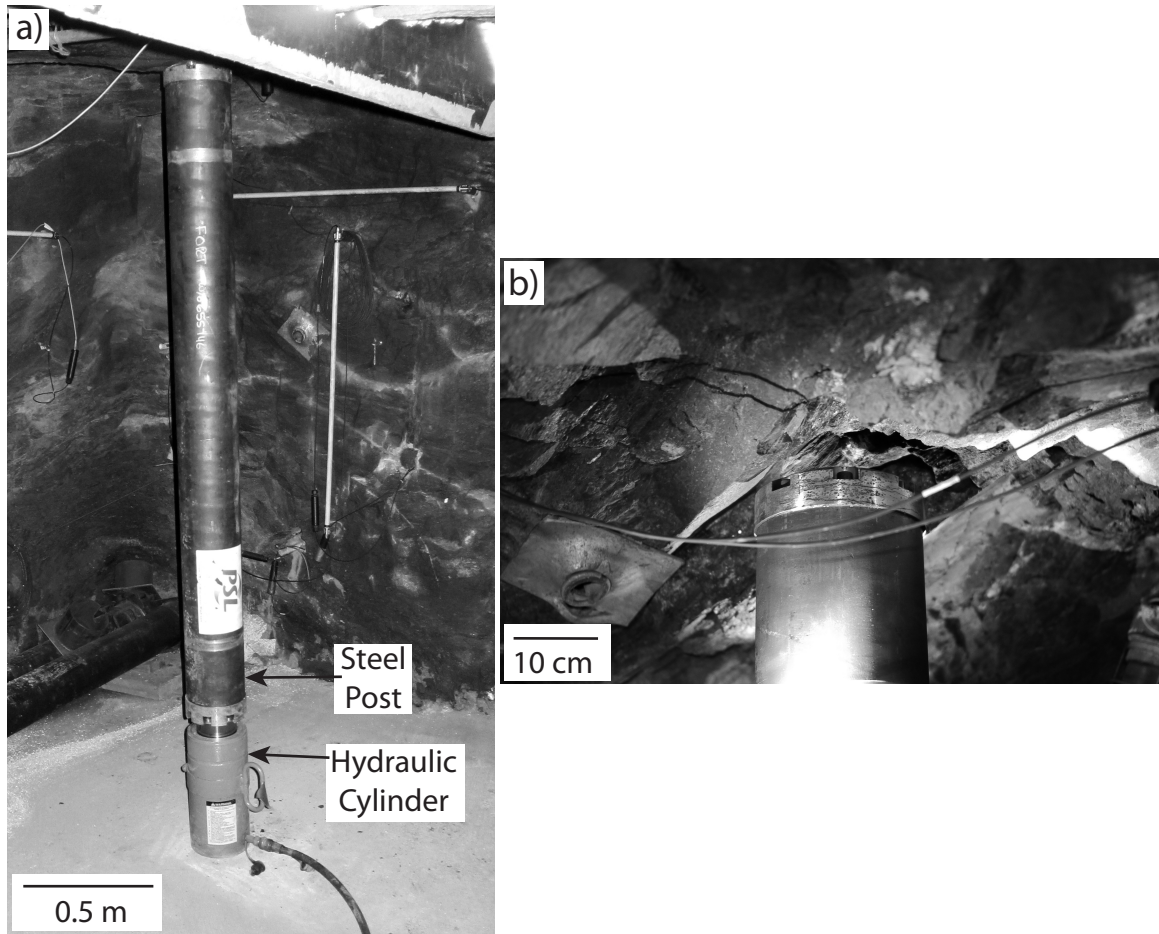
a) Photograph of hydraulic cylinder and steel post set up for 890 kN point-loading test. b) Close-up photograph of rounded head of steel post where it contacted the rock mass for the 890 kN loading test location #1.
